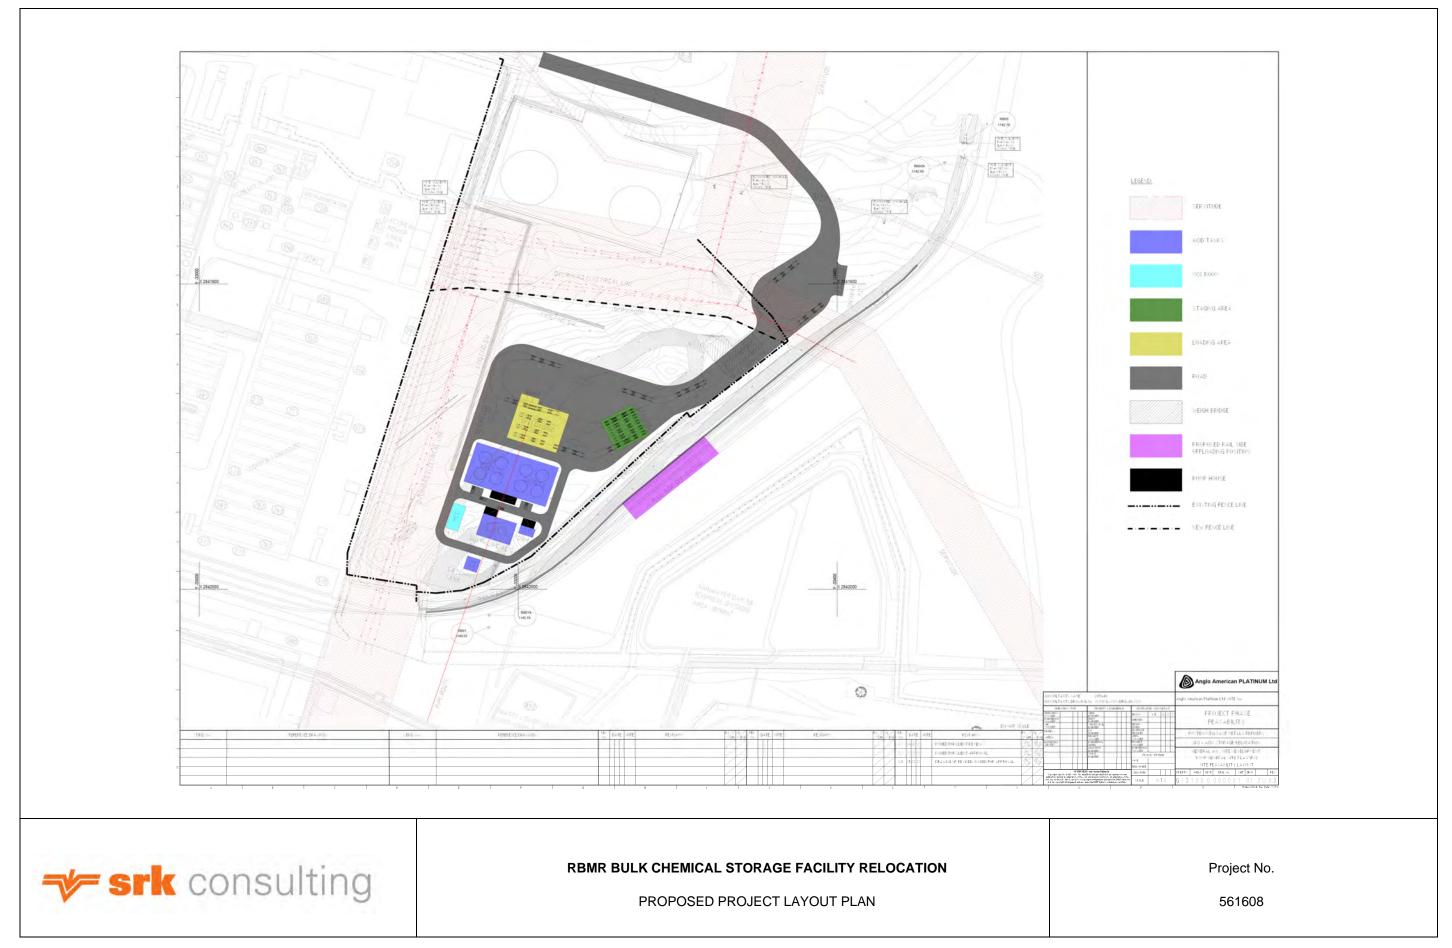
Proposed Layout Plan of the bulk chemical storage facility
